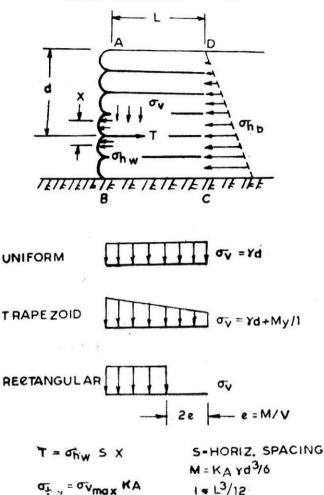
Assumption in Some Working Hypotheses on Reinforced Earth Walls where,
